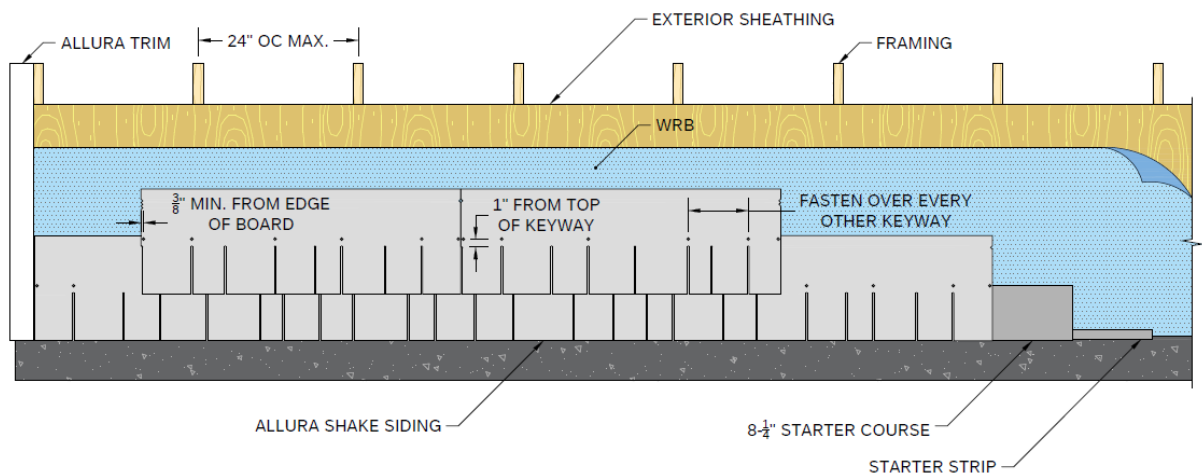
Allura® Shake Select Siding Blind Nail Fastening Details
